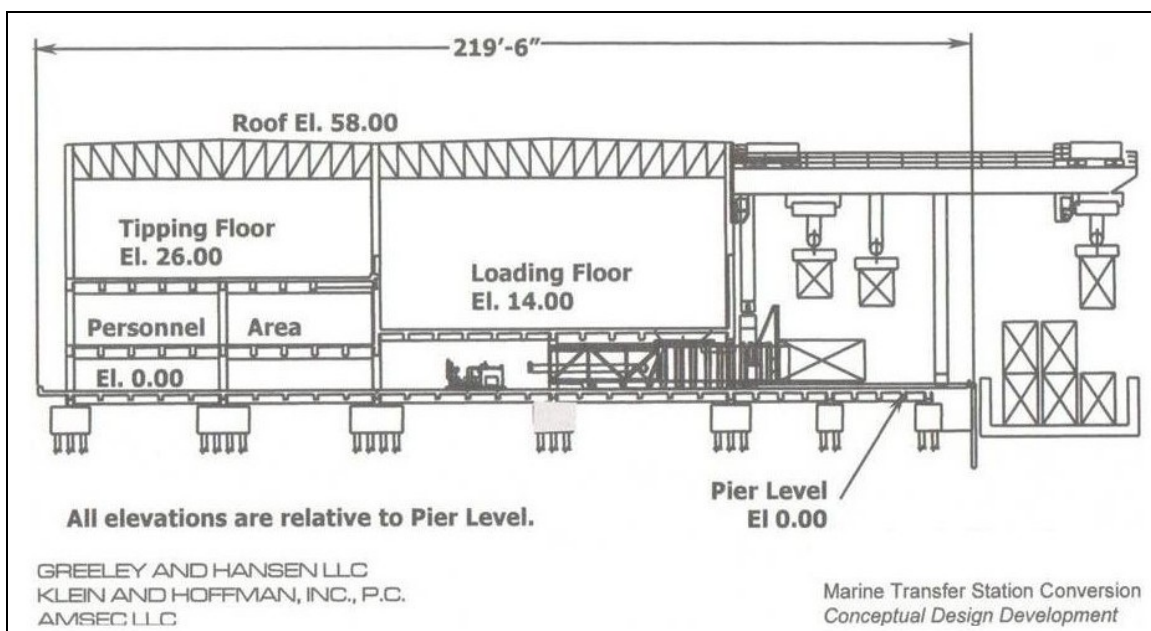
Cross-section of proposed MTS⁽¹⁰⁾.
